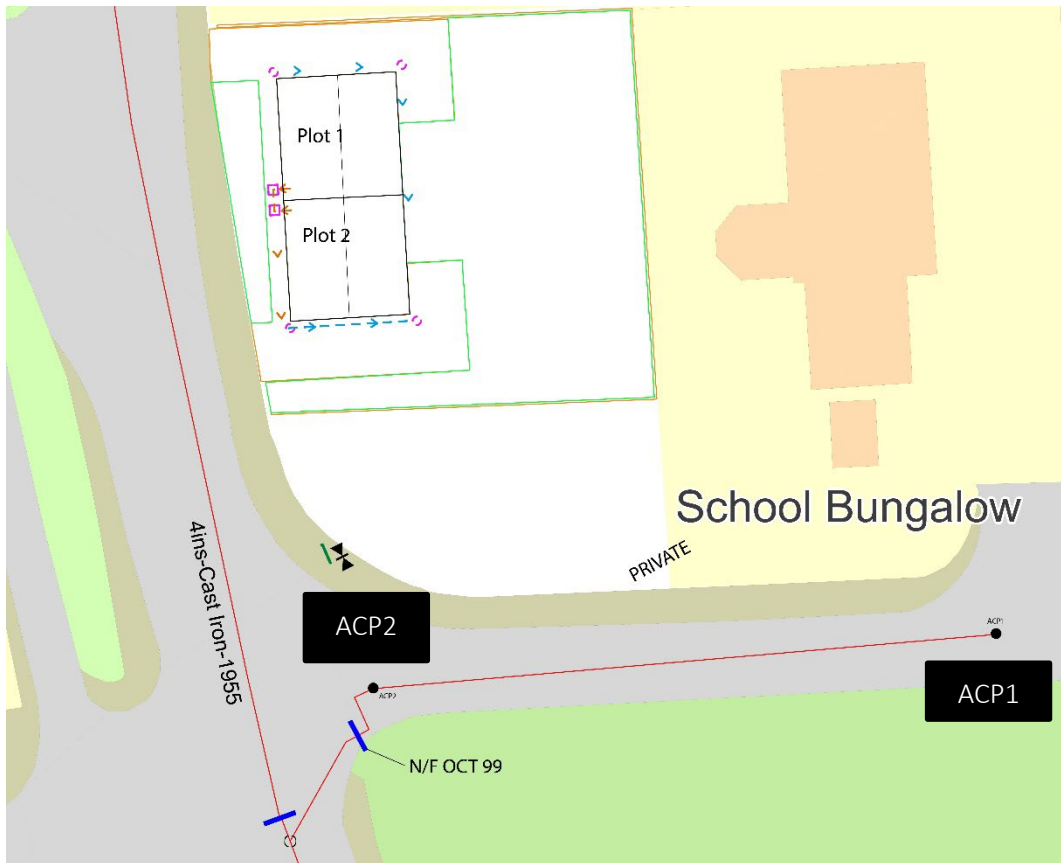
YW Combined Sewer Asset Plan (Drawing Ref: YW-CAS-245166)
